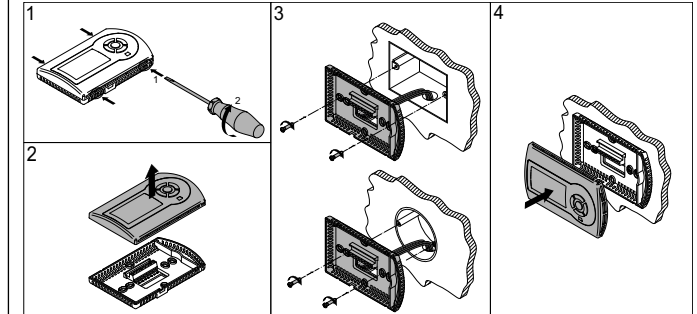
Wall mounting AHS2. Spacing between 83.5 mm fixing holes with box, for example: Bticino 503E. Spacing between 60 mm fixing holes with round box, for example: Gewiss GW 24 232.
